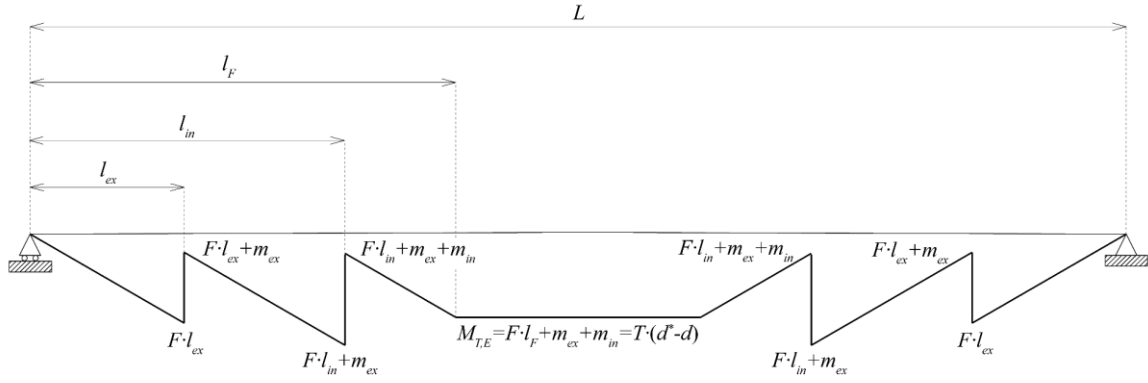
Bending moment on the timber component of the timber-steel hybrid beam.
